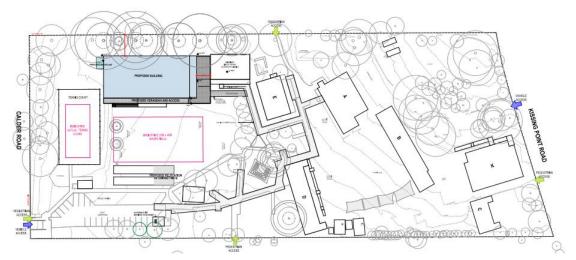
Proposed Scope of Works (Source: Fulton Trotter Architects, Proposed Site Plan (Rev P5))
